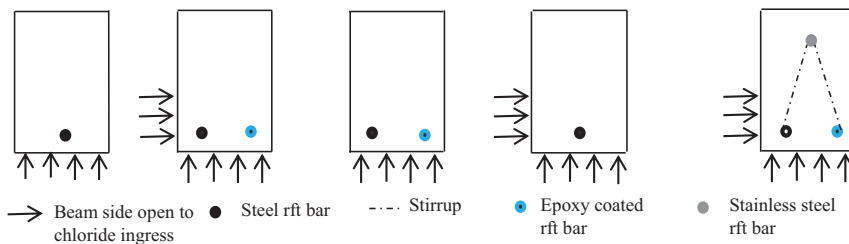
RC beam specimen reinforcement (rft) details and chloride penetration
